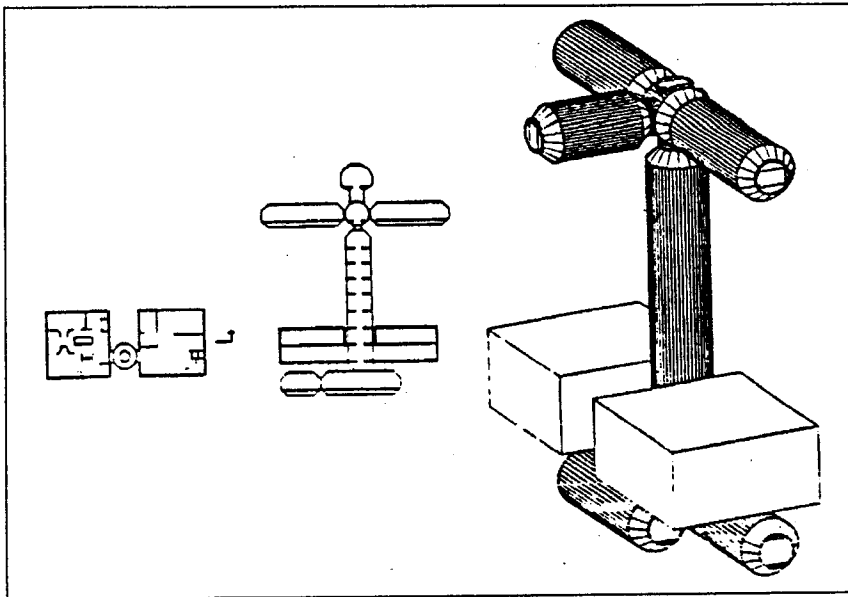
Hybrid underground design; plan, section and perspective (from Moore & Rebholz, 1992).
